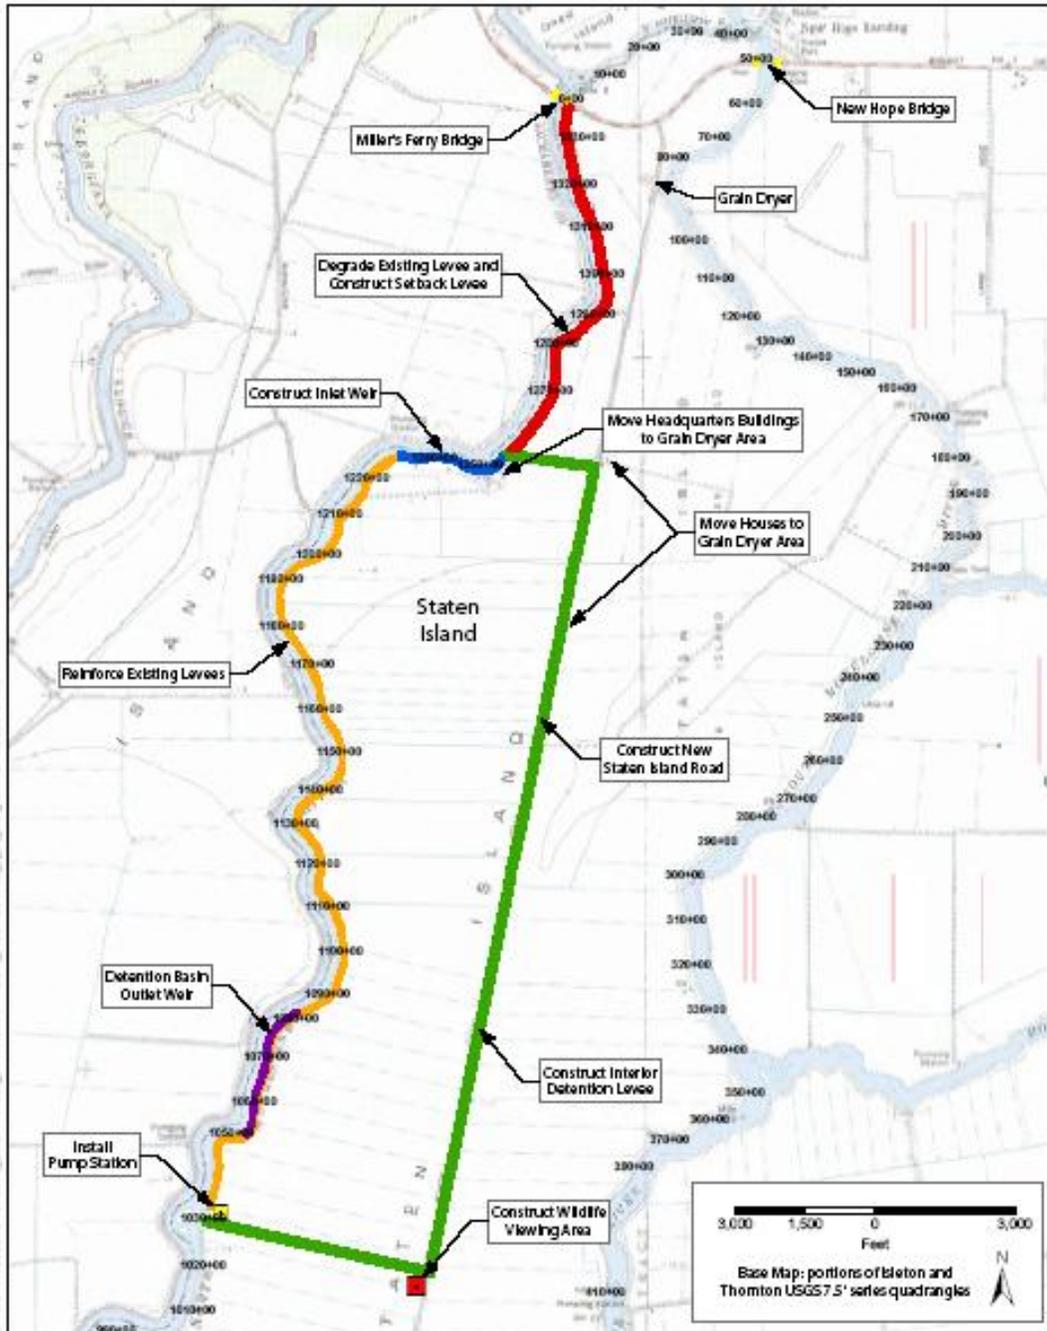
Alternative 2-B: West Staten Detention Plan
